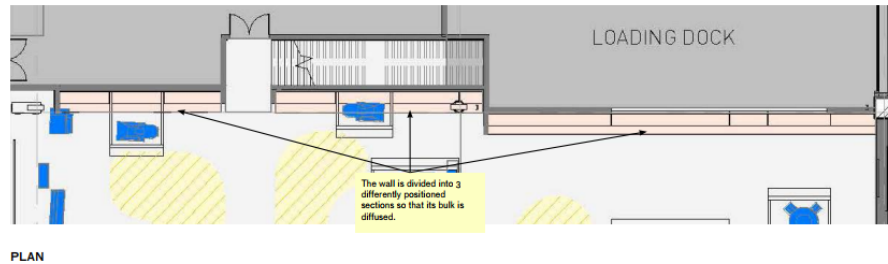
LOADING DOCK WALL DESIGN FEATURES (SOURCE: TRIGGER 2017)
